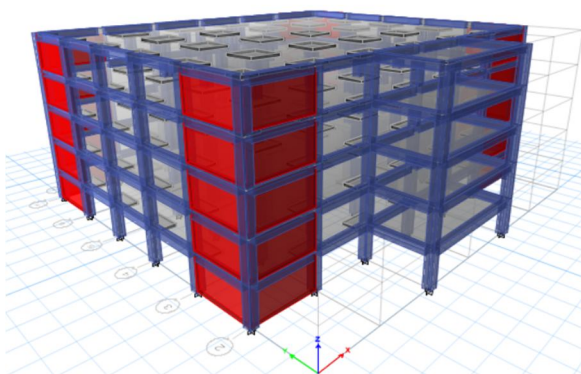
3D View of Flat Slab with Shear Wall Structure
